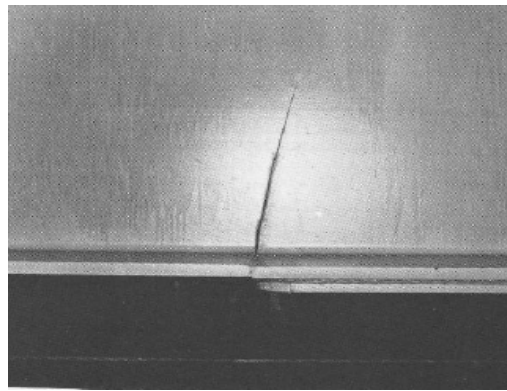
Cracked girder of the Lafayette Street Bridge (Fisher 1984)
